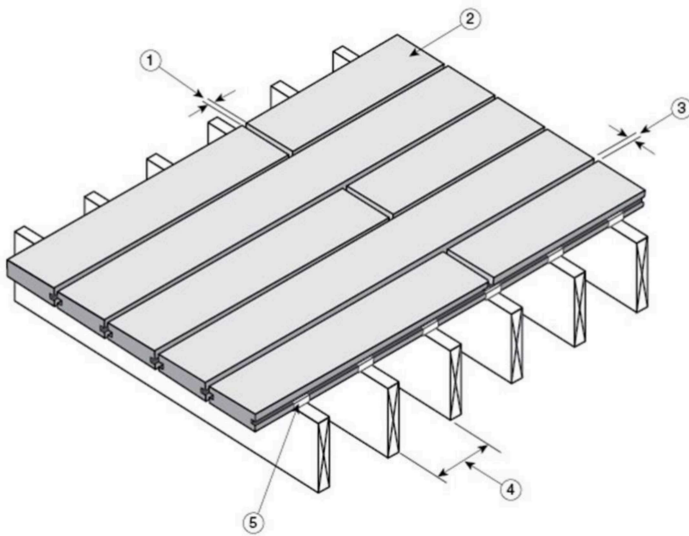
Installation details for the grooved-edge Clubhouse® Deck products with hidden fasteners
